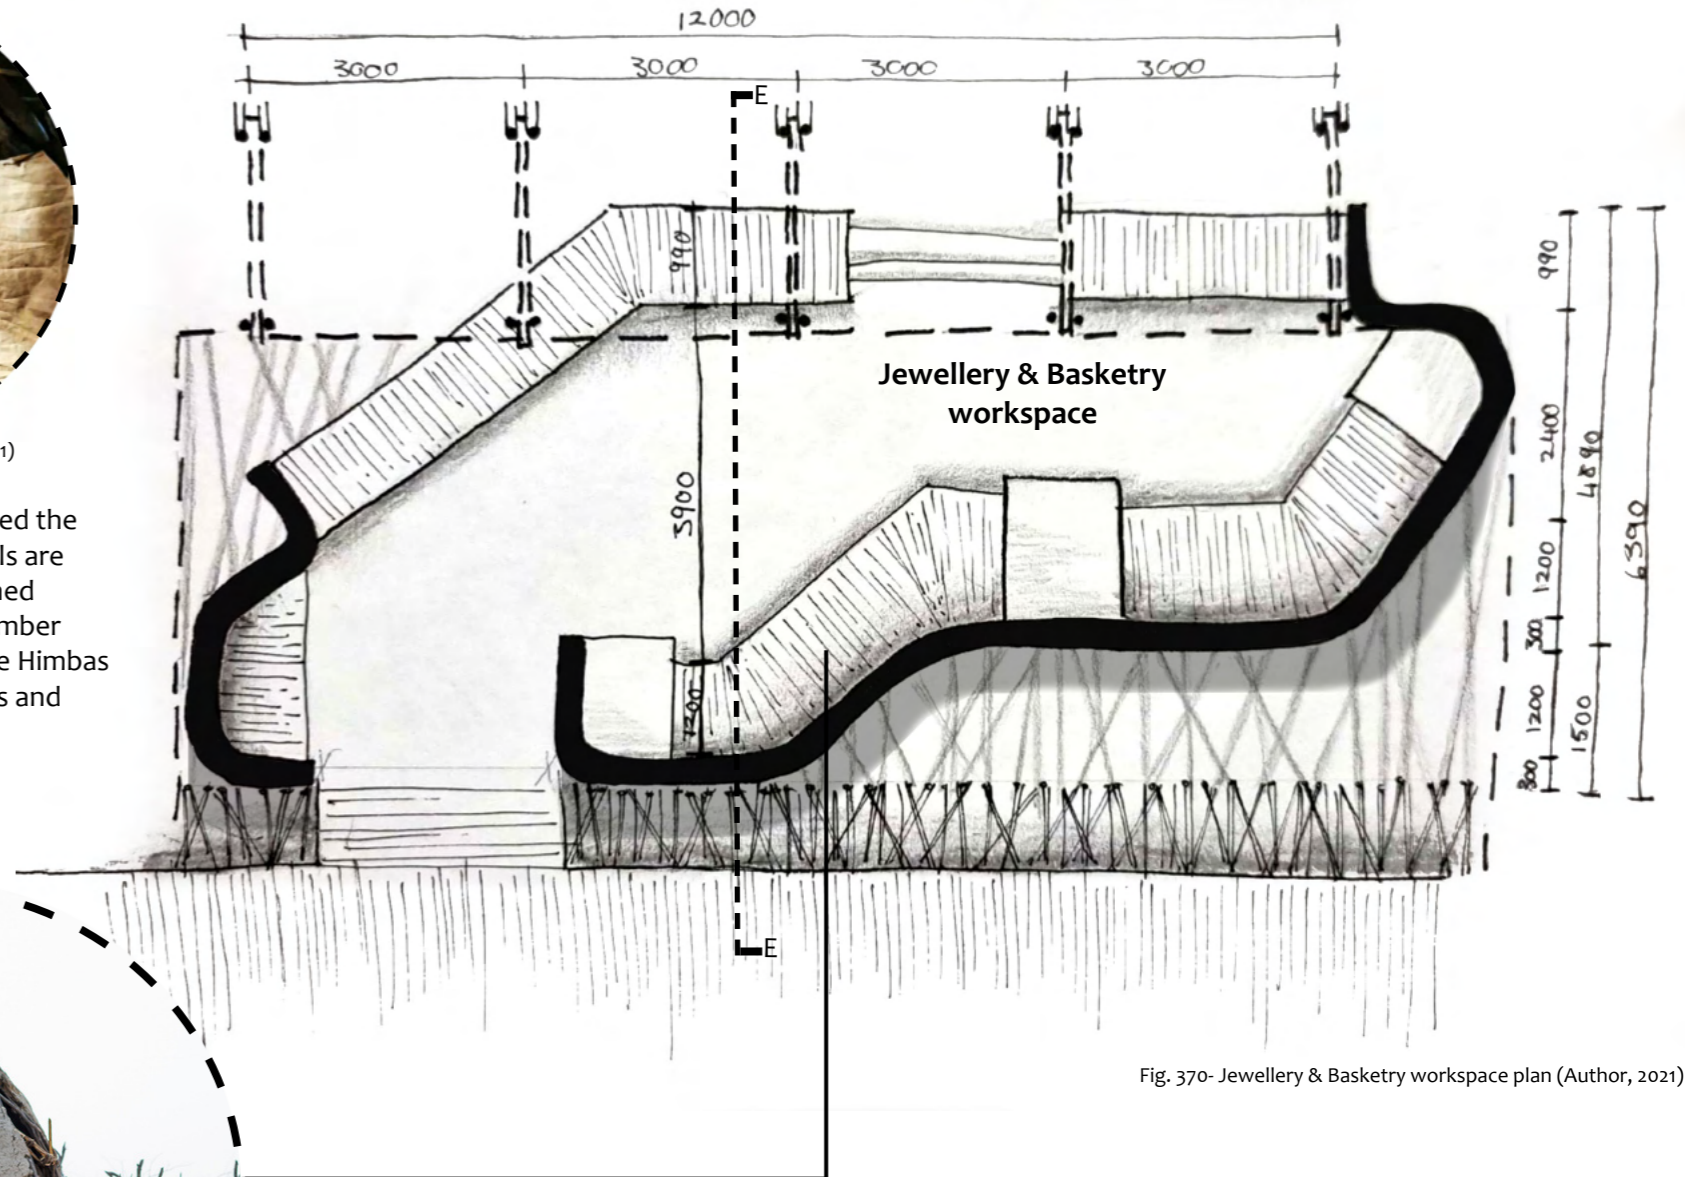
Jewellery & Basketry workspace plan (Author, 2021)
